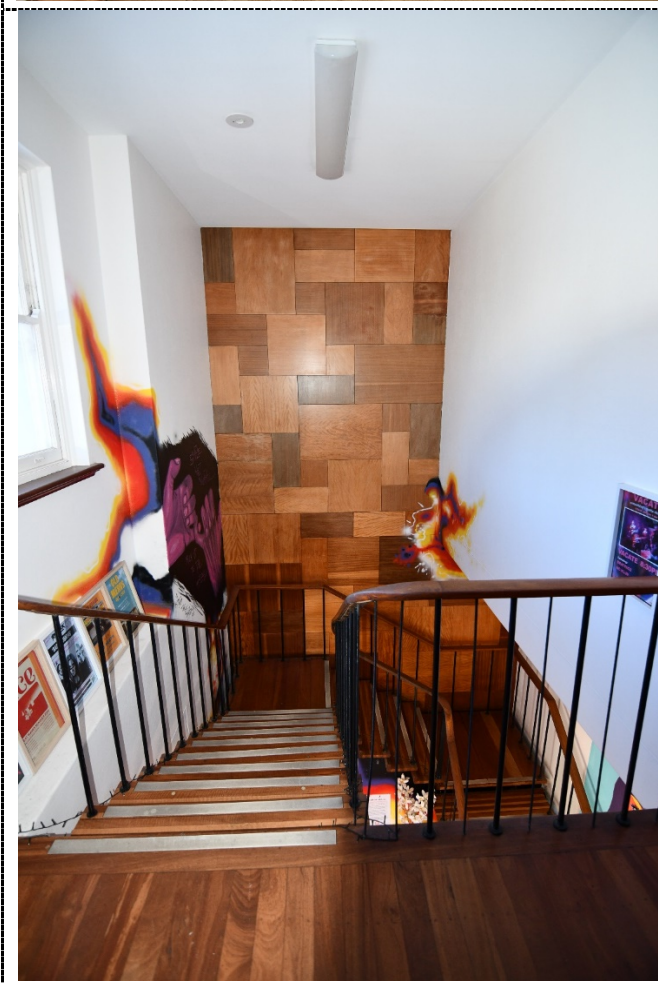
Interior view of original staircase with original timber veneer wall art behind. The veneer is still intact and of high integrity however the current tenants have spray painted a small section of the timber veneer.
